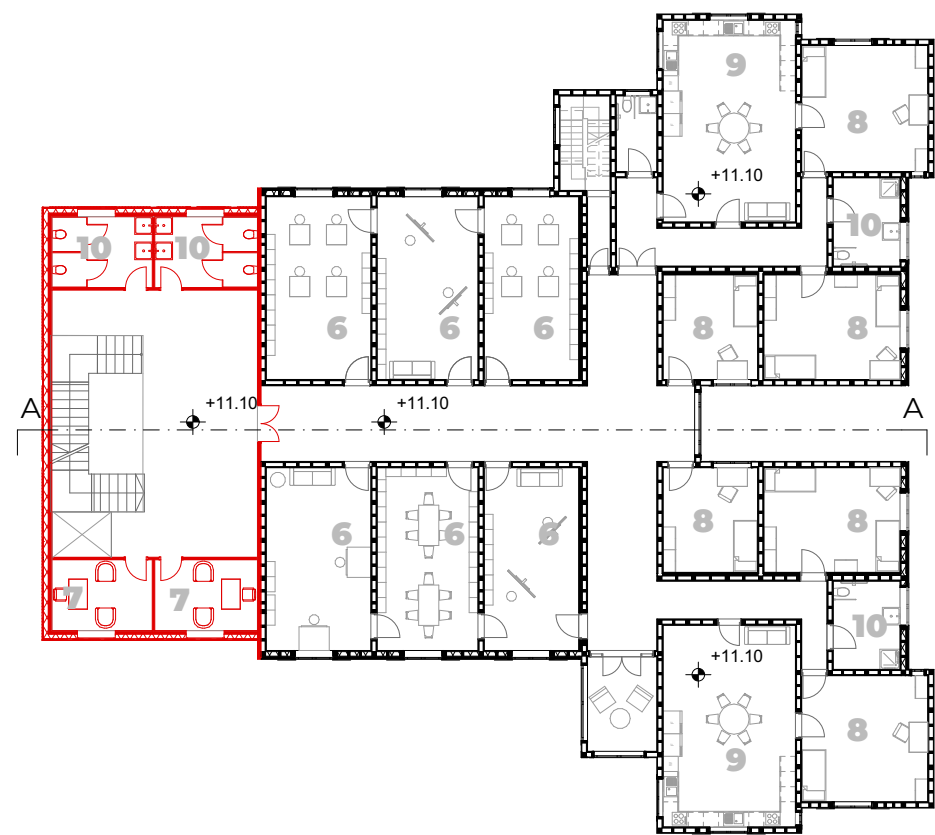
Second Floor Plan (Source: Created by the author, 2025)
